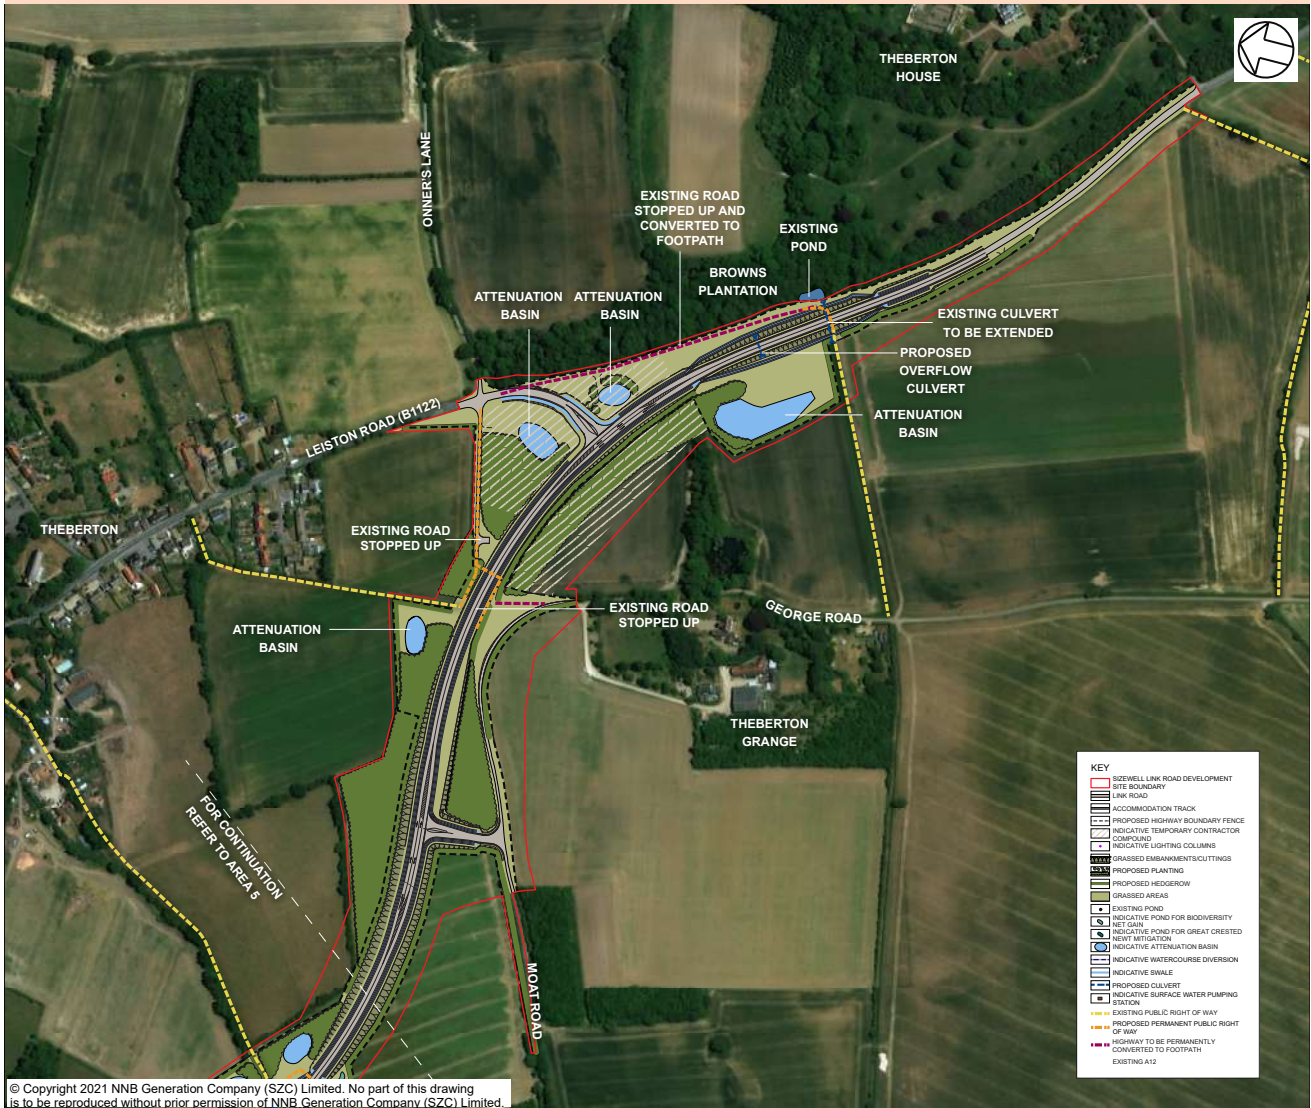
E: Illustrative masterplan of the Sizewell link road – Inset 5
